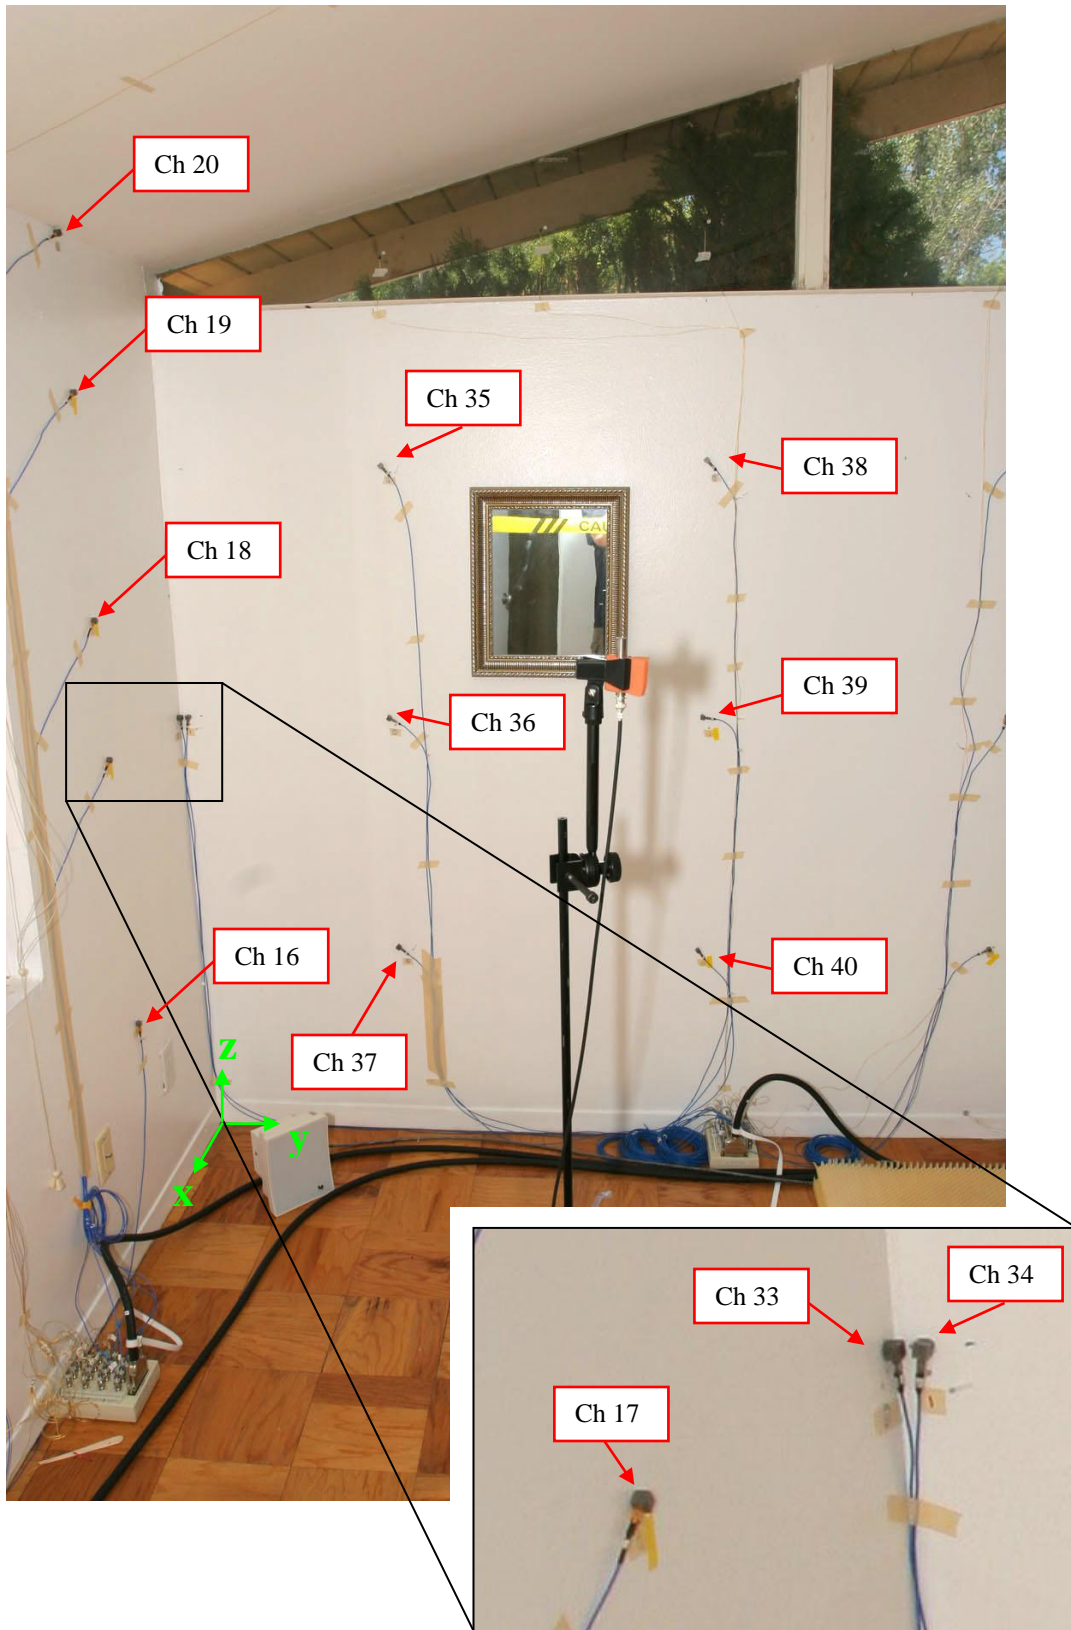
Typical picture of accelerometers mounted to the wall in the front bedroom. Detail shows co-located accelerometers mounted to the west and north walls.
